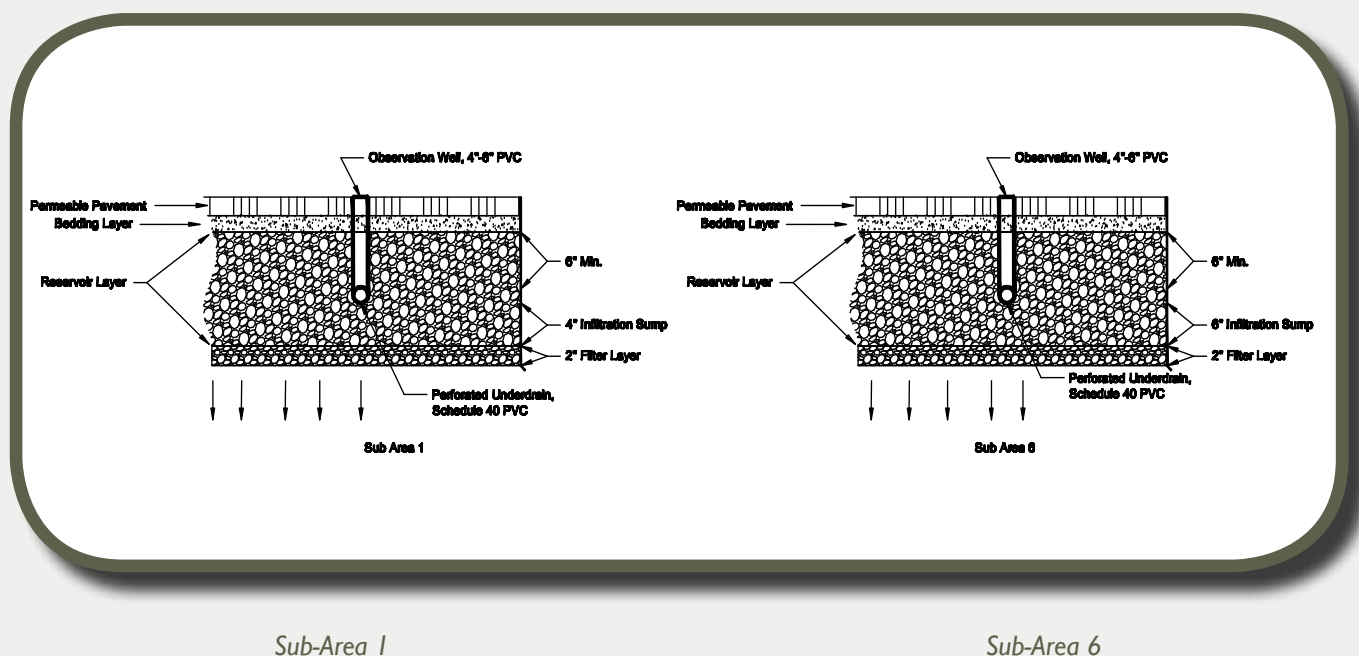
Typical Level 2 Permeable Pavement Infiltration Sump Section
